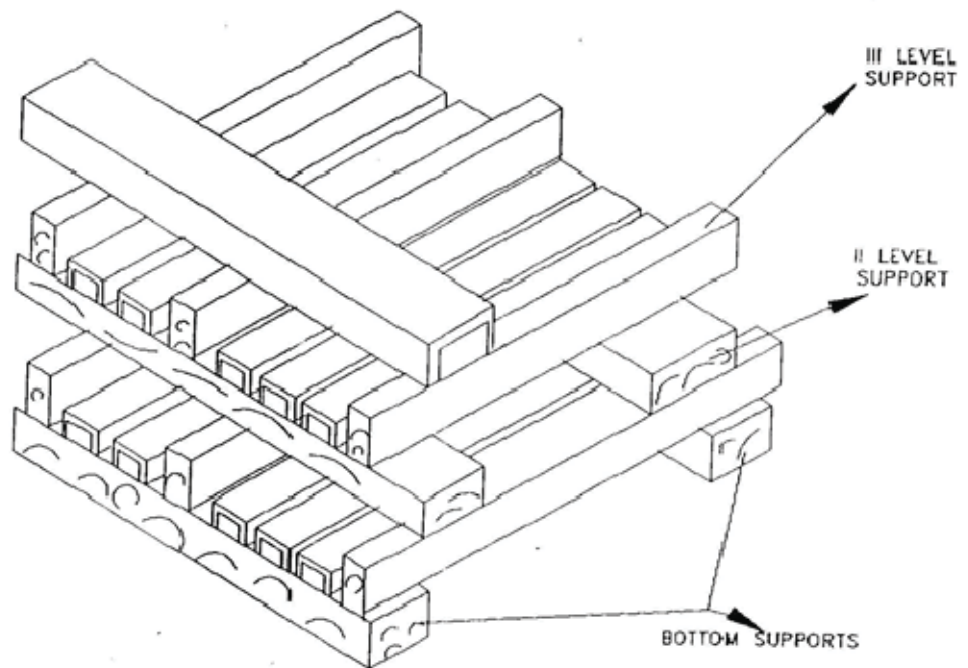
STRUCTURAL STEEL STACKING ARRANGEMENT
